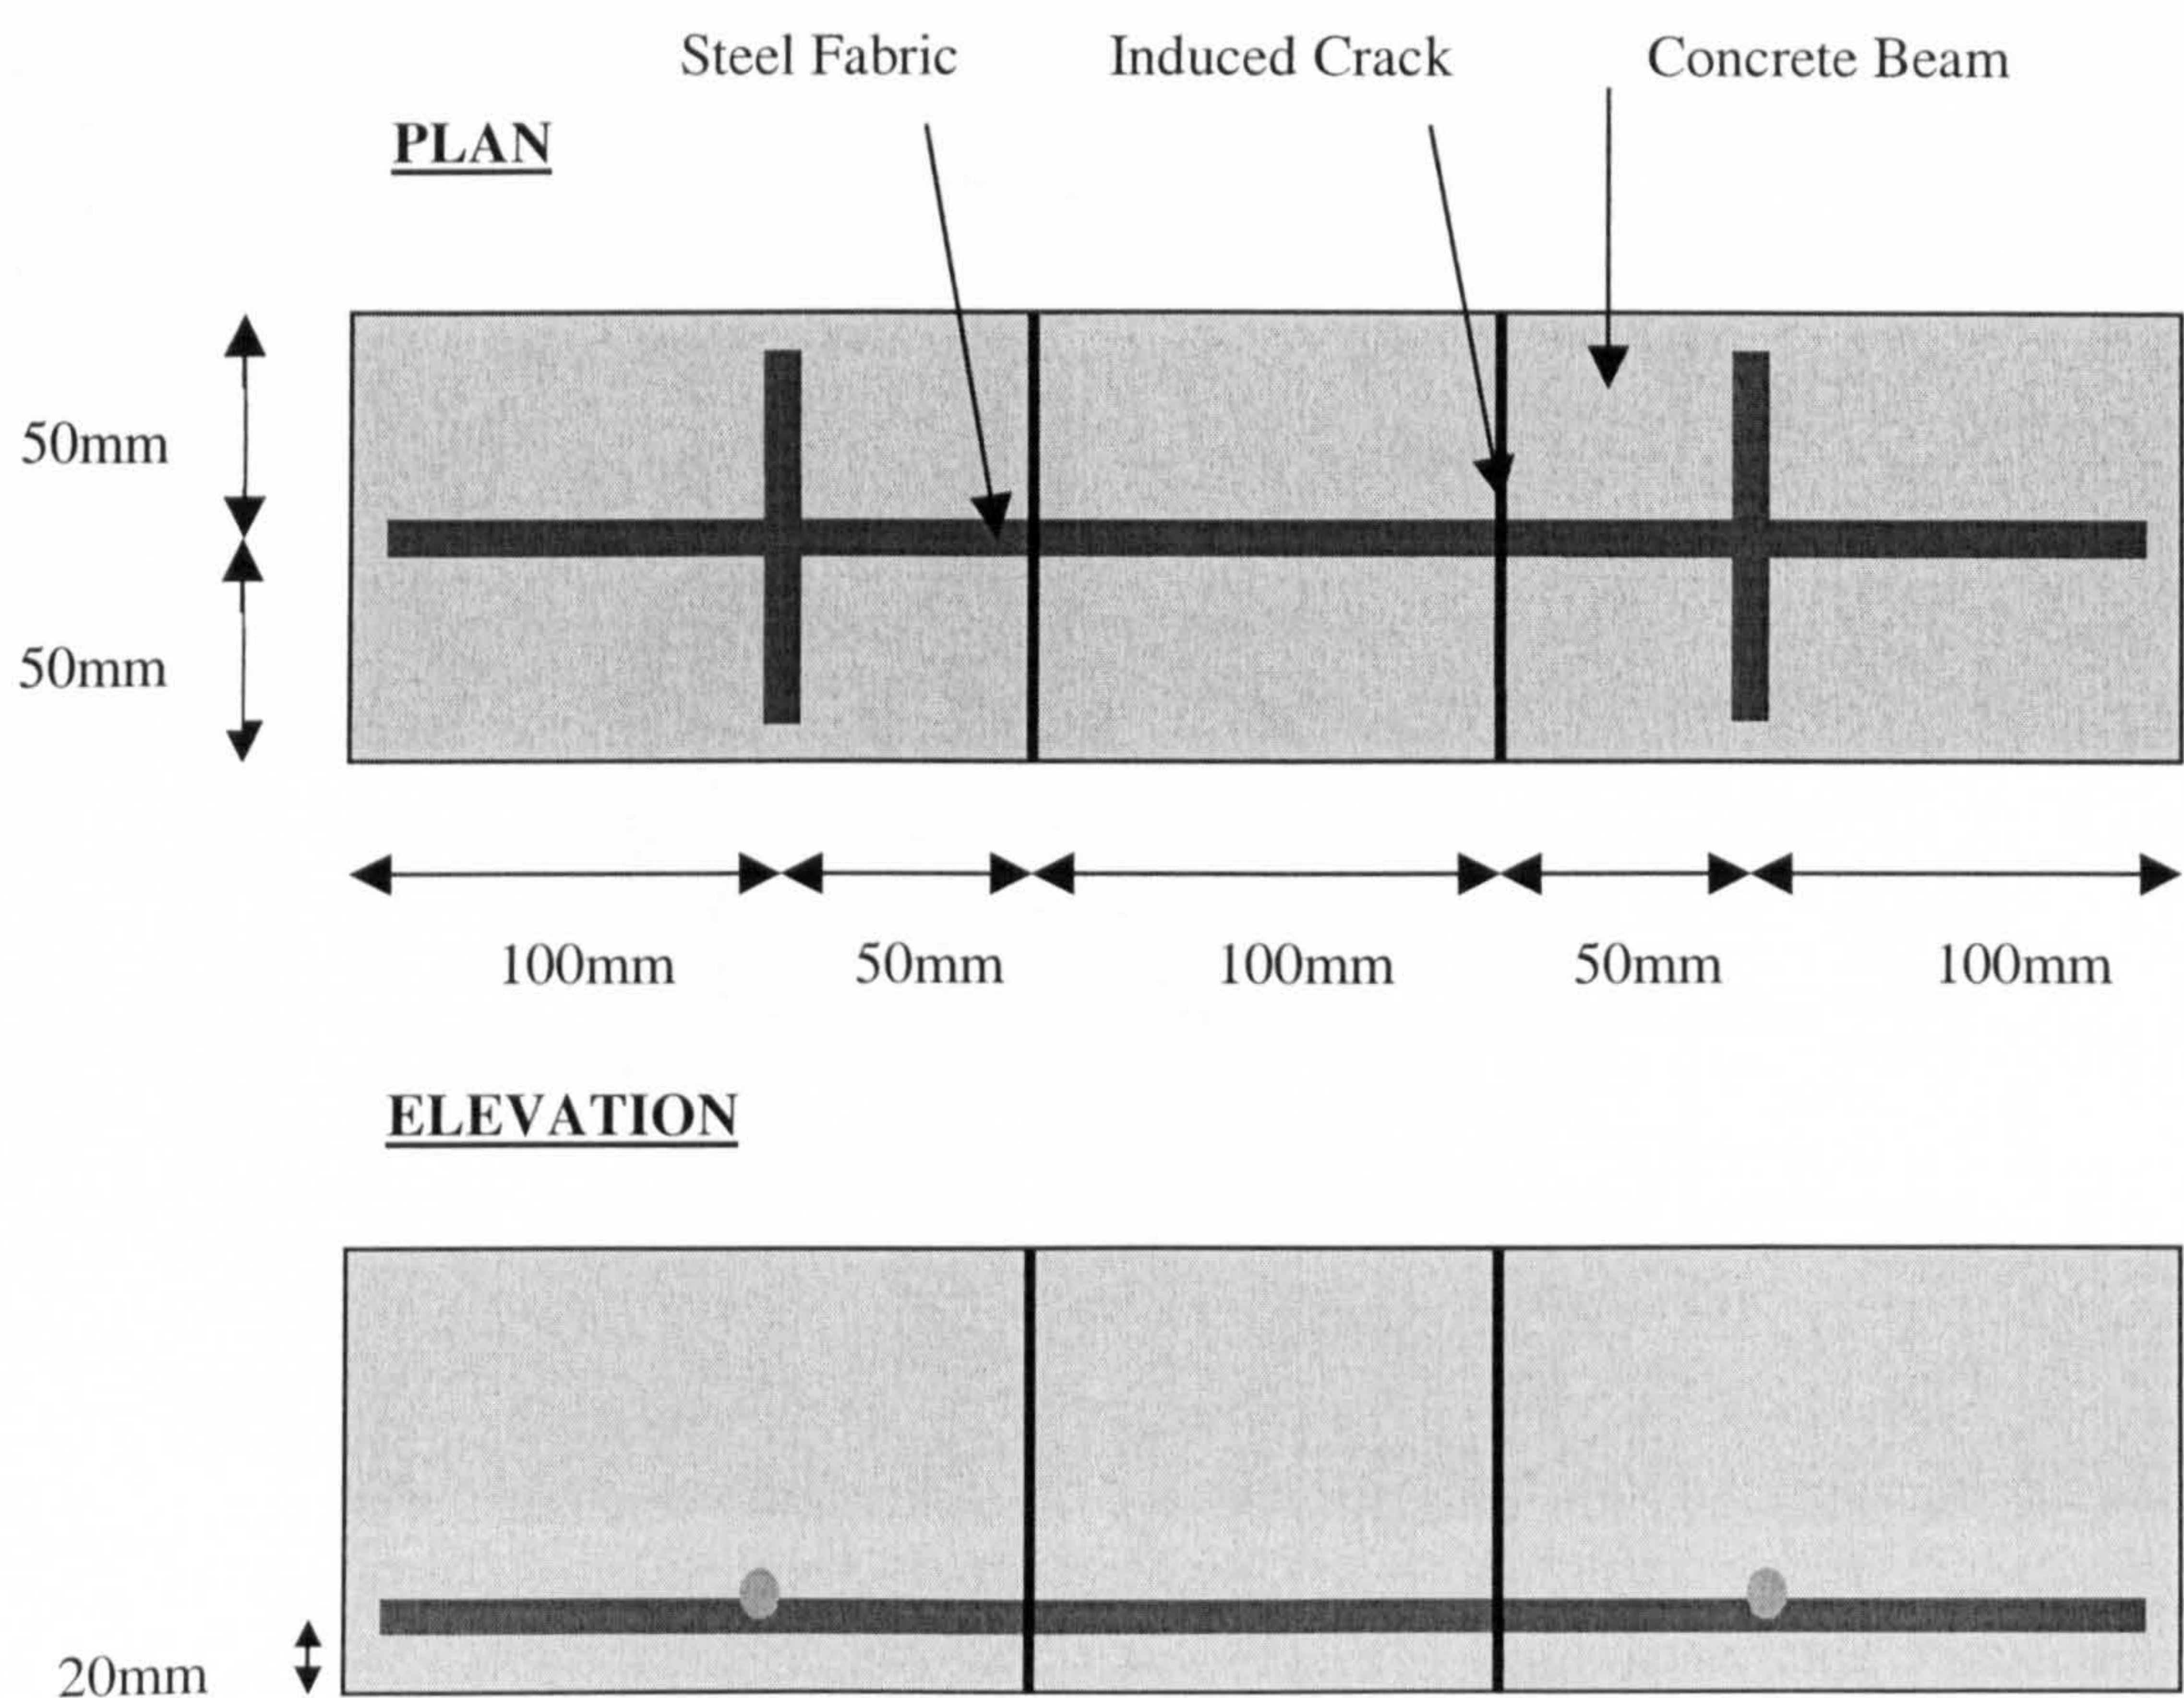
Steel fabric and reinforcing bar layout and positioning
